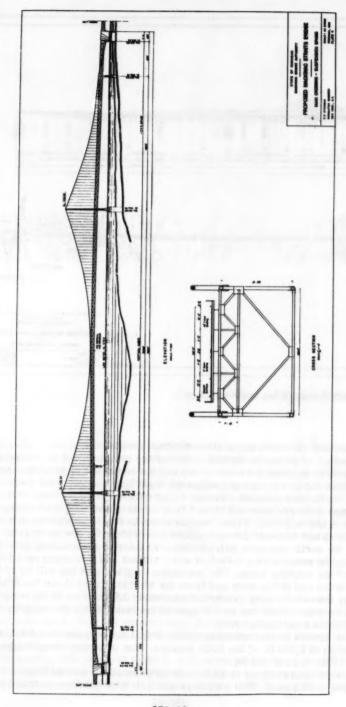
General Drawing of Suspension Bridge. (Elevation and Cross Section.)
